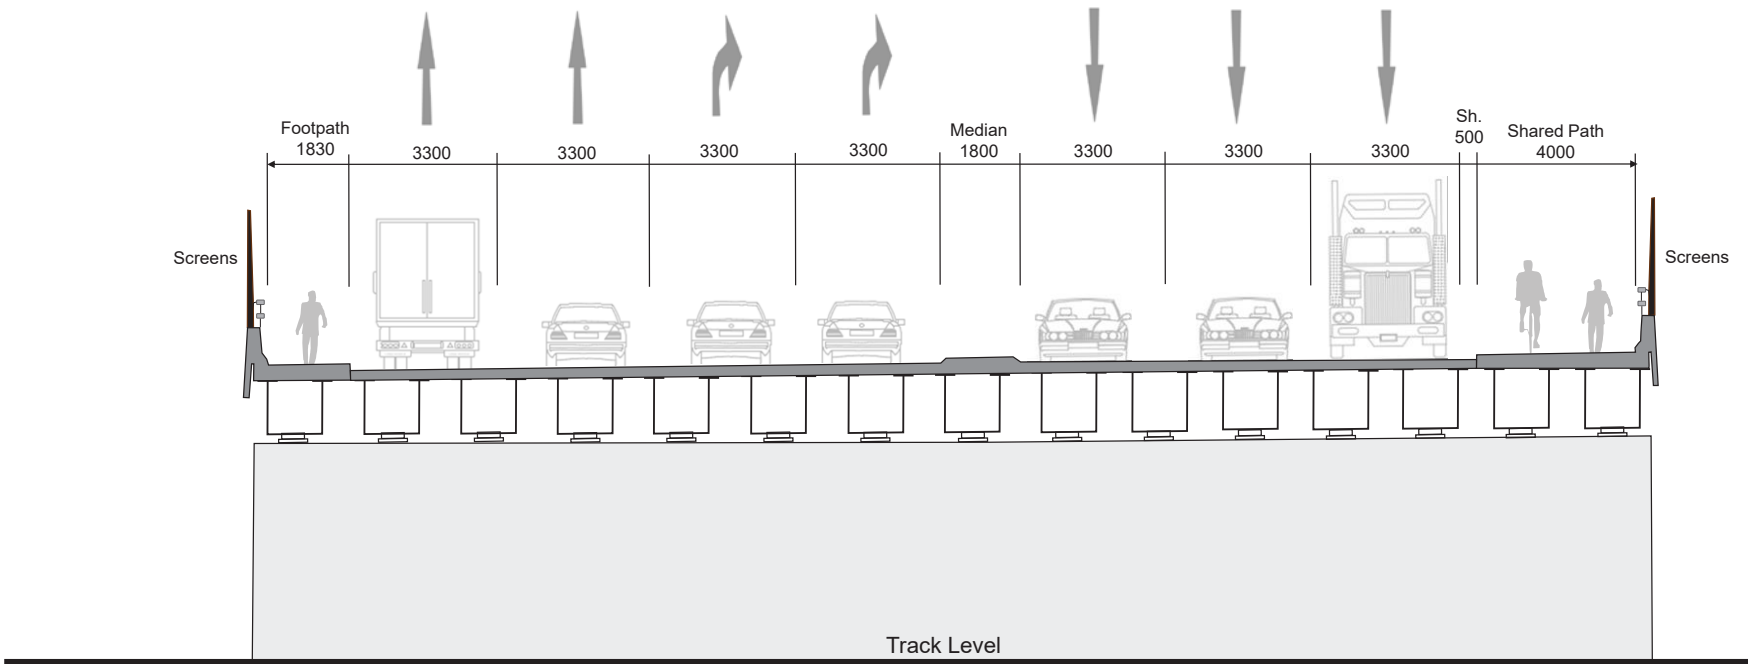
Cross-section through the proposed bridge structure, subject to detailed design development
